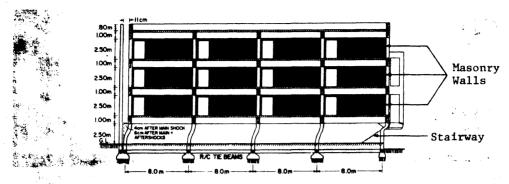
LONGITUDINAL ELEVATION OF THE ENET NO. 2 BUILDING ILLUSTRATING PERMANENT DISPLACEMENT AFTER EARTHQUAKE
